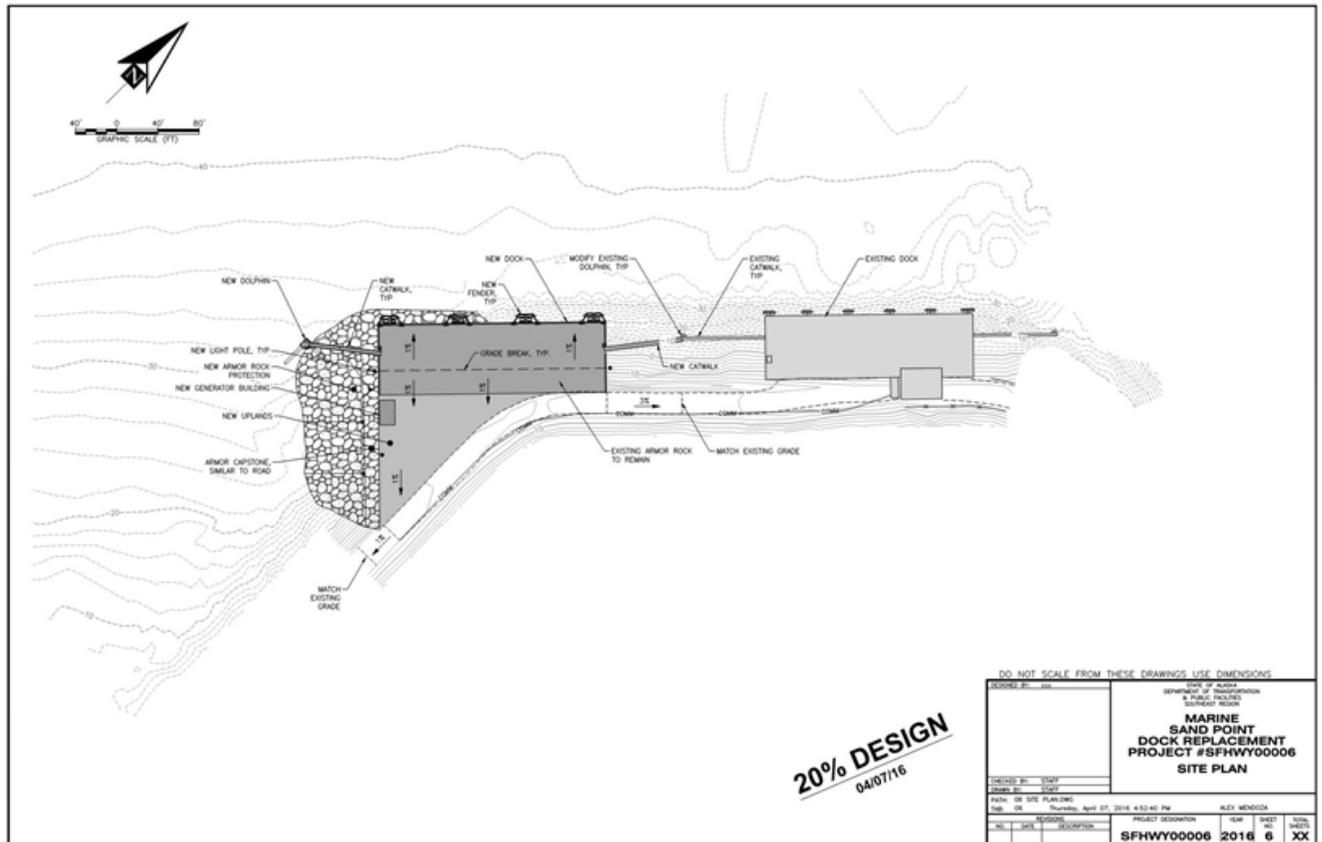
Sand Point City Dock replacement site plan drawing, aerial view (PND 2015).
